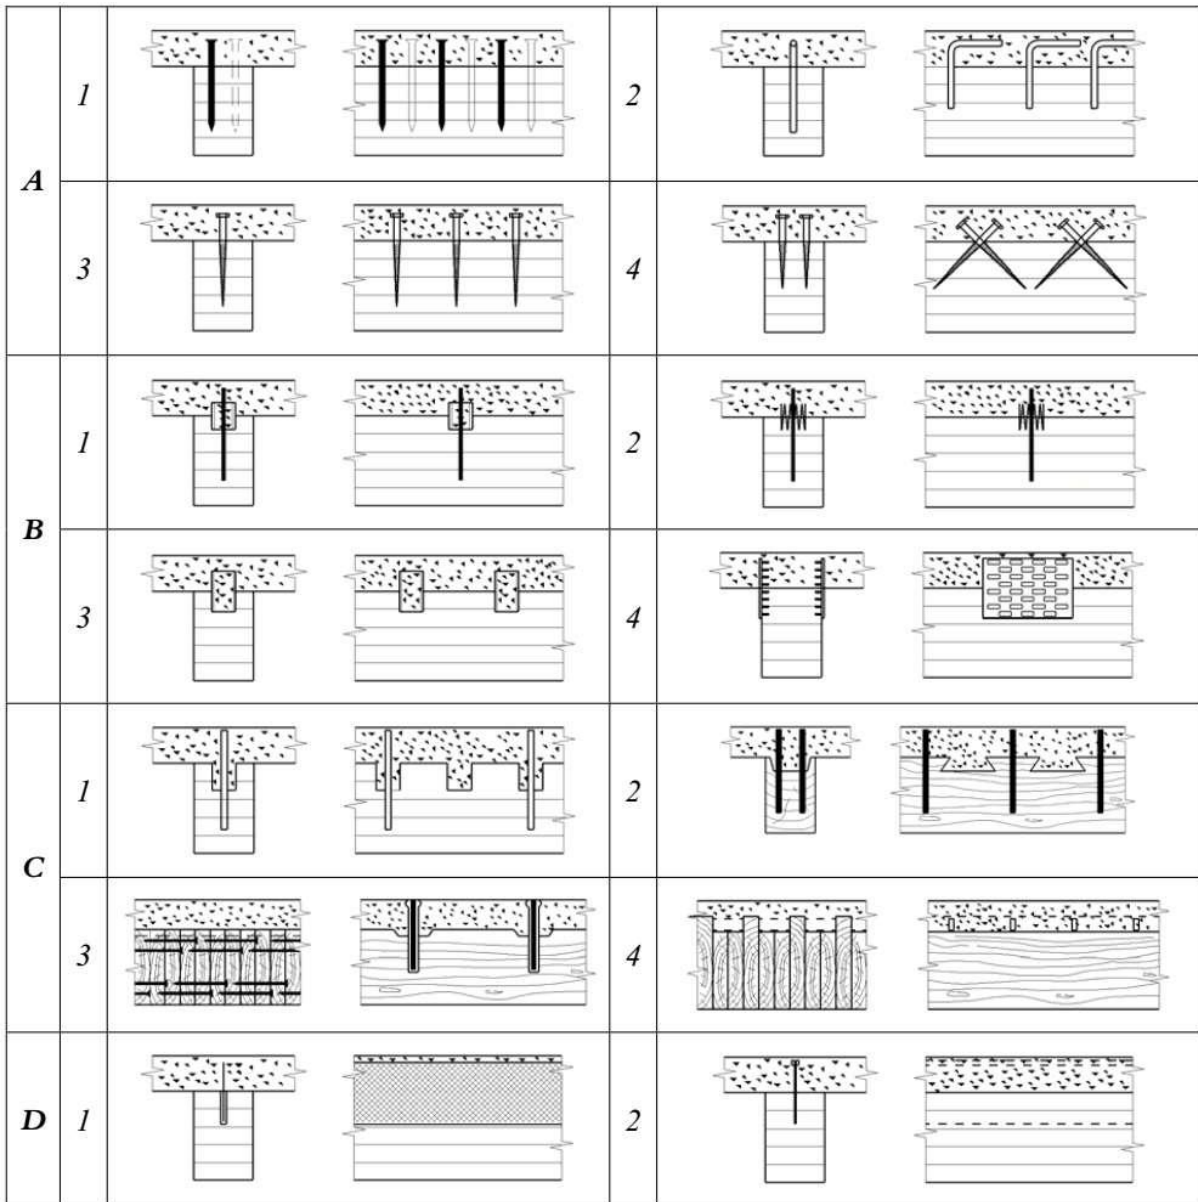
Timber concrete composite connections with: “nails (A1); glued reinforced concrete steel bars (A2); screws (A3); inclined screws (A4); split rings (B1); split rings and toothed plates (B2); steel tubes (B3); steel punched metal plates (B4); round indentations in timber, with fasteners preventing uplift (C1); square indentations, ditto (C2); cup indentations and prestressed steel bars (C3), nailed timber planks deck and steel shear plates slotted through the deeper planks (C4), steel lattice glued to timber (D1); and steel plate glued to timber (D2).”. Adopted from (Ceccotti, 2002)
